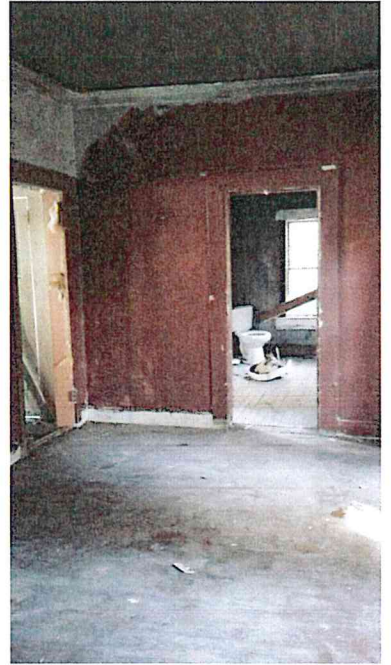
EXHIBIT C: PHOTOS OF SUBJECT SITE INTERIOR
